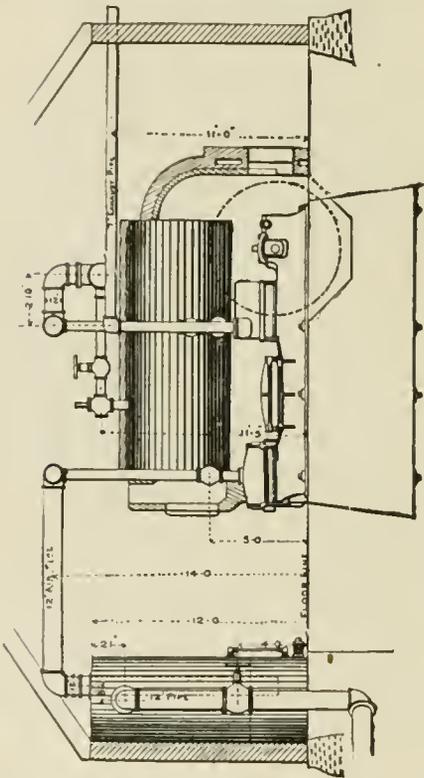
Washington, D. C., Aqueduct Tunnel Plant—End Elevation.
